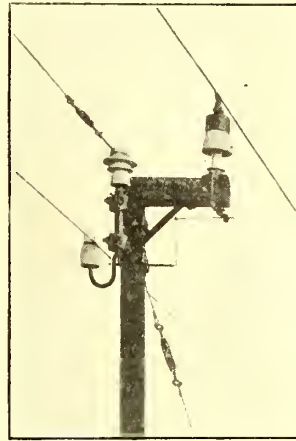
SINGLE WIRE HELD BY WIRE HOLDERS RIGIDLY SUPPORTED.
